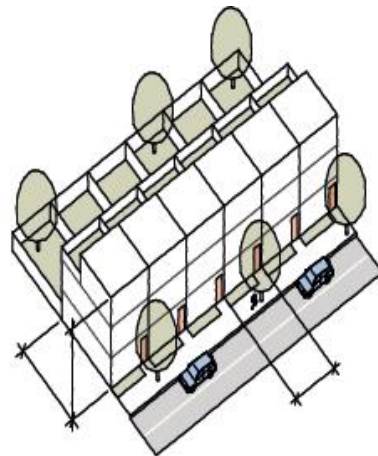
Town house - adding a storey to the typical terrace typology (Allies and Morrison sketch)
